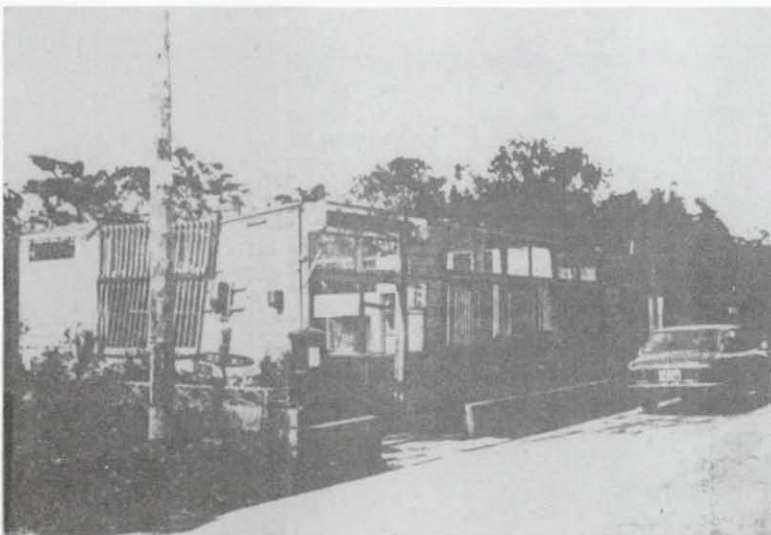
POST OFFICE WHOSE ROOF WAS BLOWN AWAY
